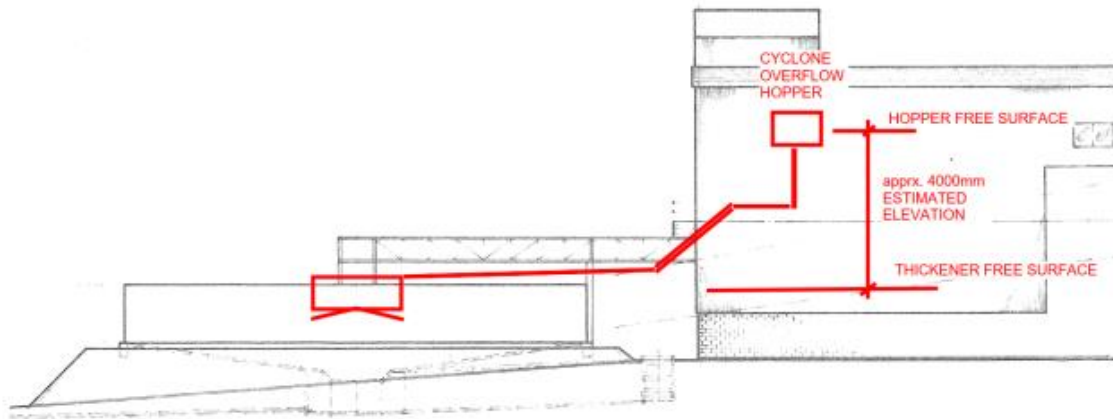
Schematic showing thickener upstream feed arrangement, note the significant elevation drop to thickener.
